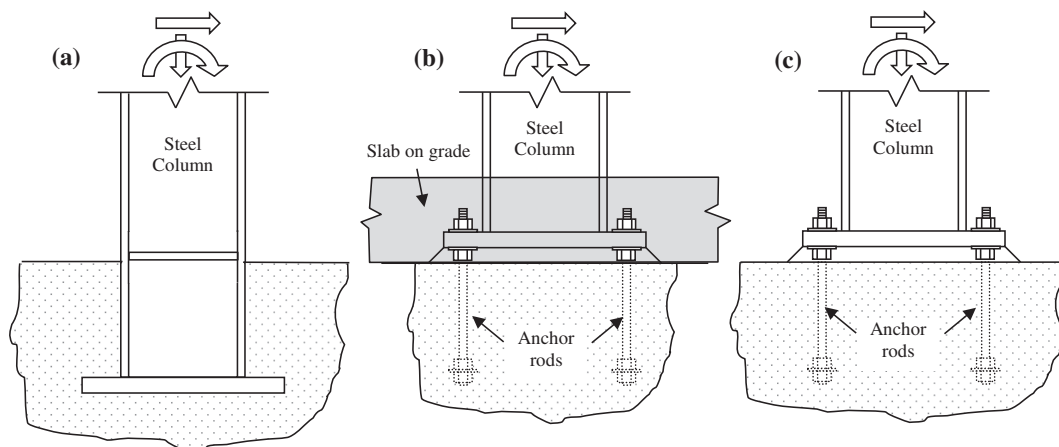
Column base connection types: (a) deeply embedded, (b) shallowly embedded due to overtopping slab, and (c) exposed with base plate and anchor rods.
